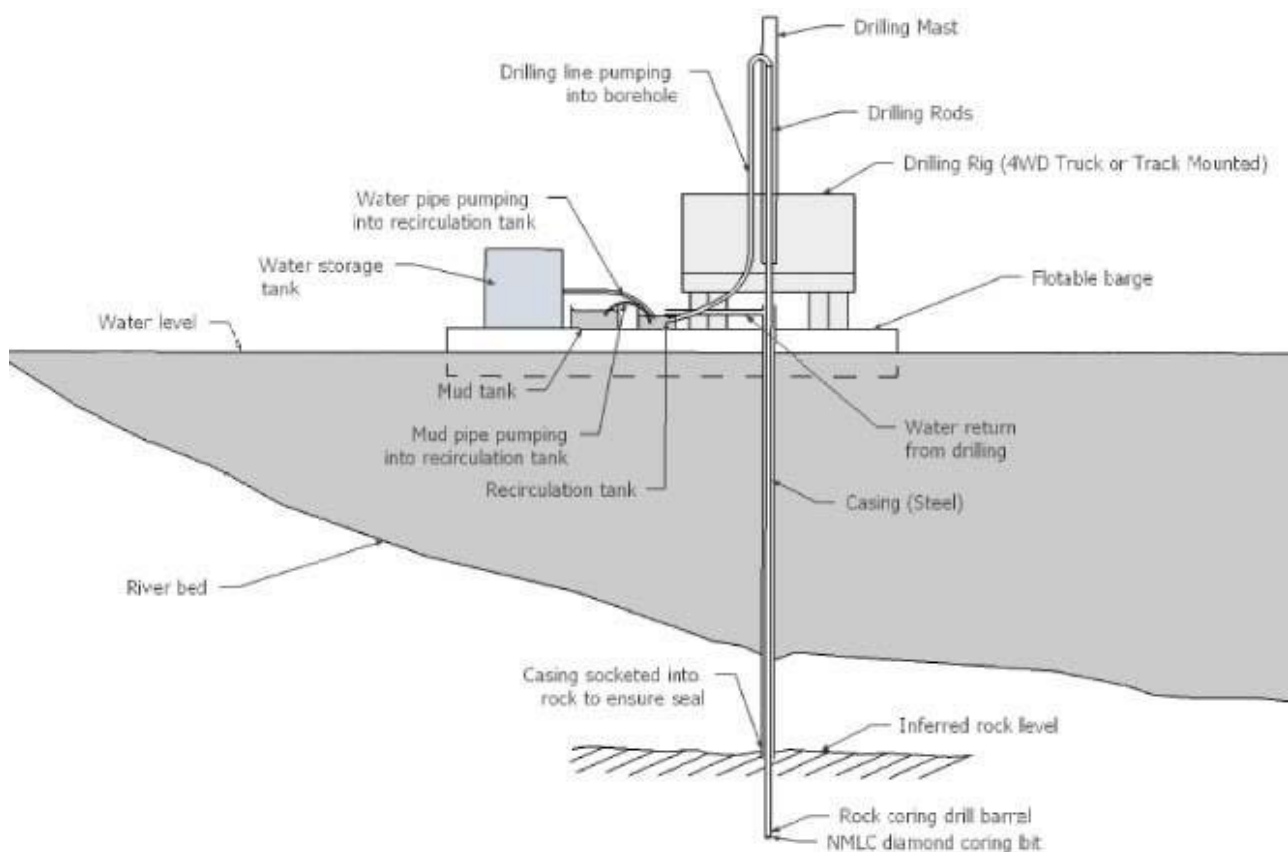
Typical barge geotechnical drilling set-up (cross section)
